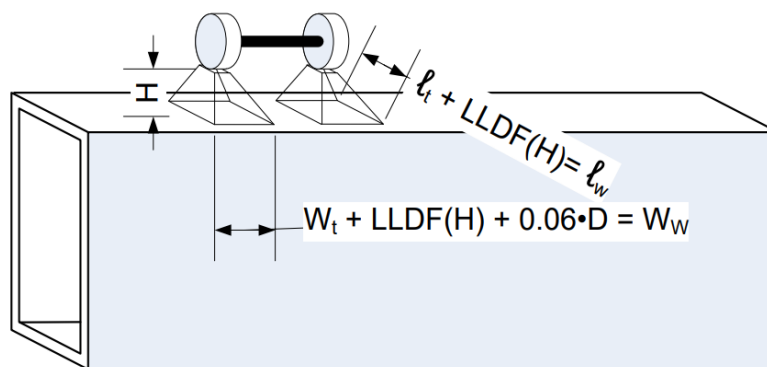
Live Load Distribution with Greater than 2 ft. of Fill for Traffic Traveling Parallel to Span with No Projection Overlap (Used with permission from *WisDOT Bridge Manual, Chapter 36 - Box Culverts*, developed by the Wisconsin Department of Transportation)
